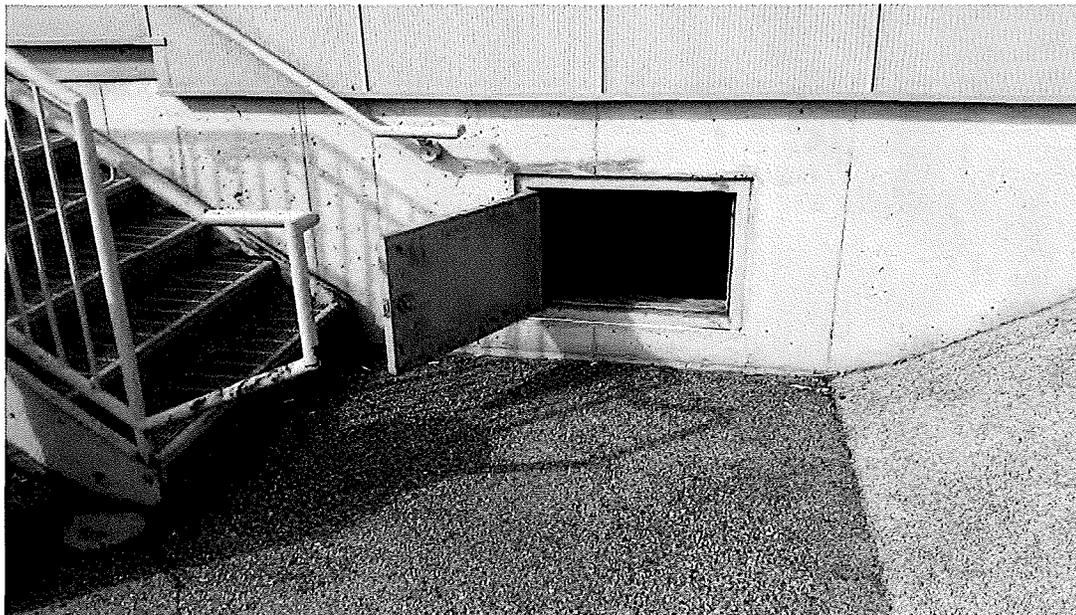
1245 Canal; crawl space entrance, column EE/FF16.
